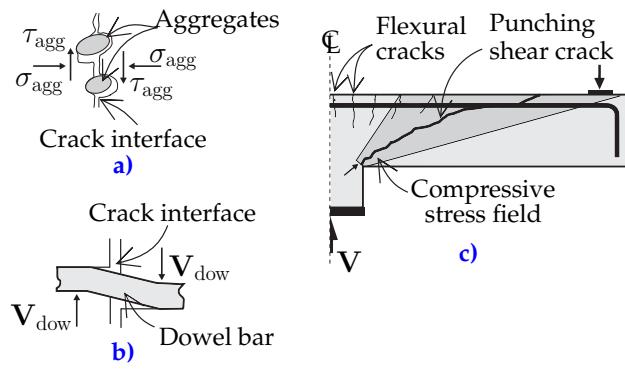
Slab-column connection cracks, adapted from [Bompa and Onet \(2015\)](#): a) Aggregate interlock; b) Dowel action; c) Compression field.
